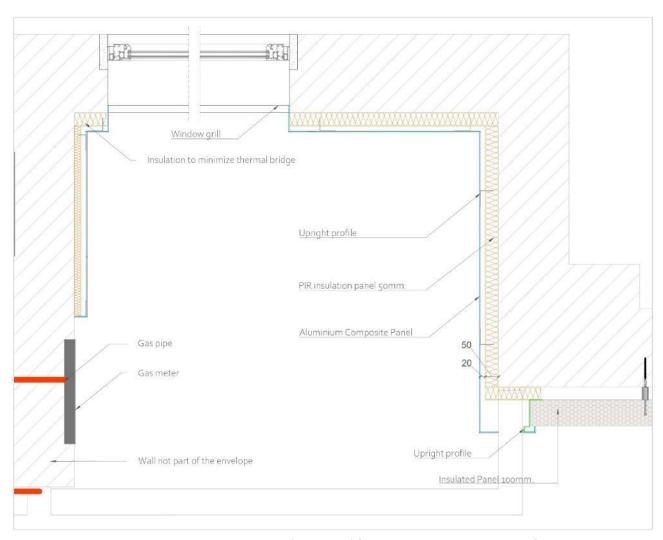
Balcony section (Horizontal) [drawing created using AutoCAD]
